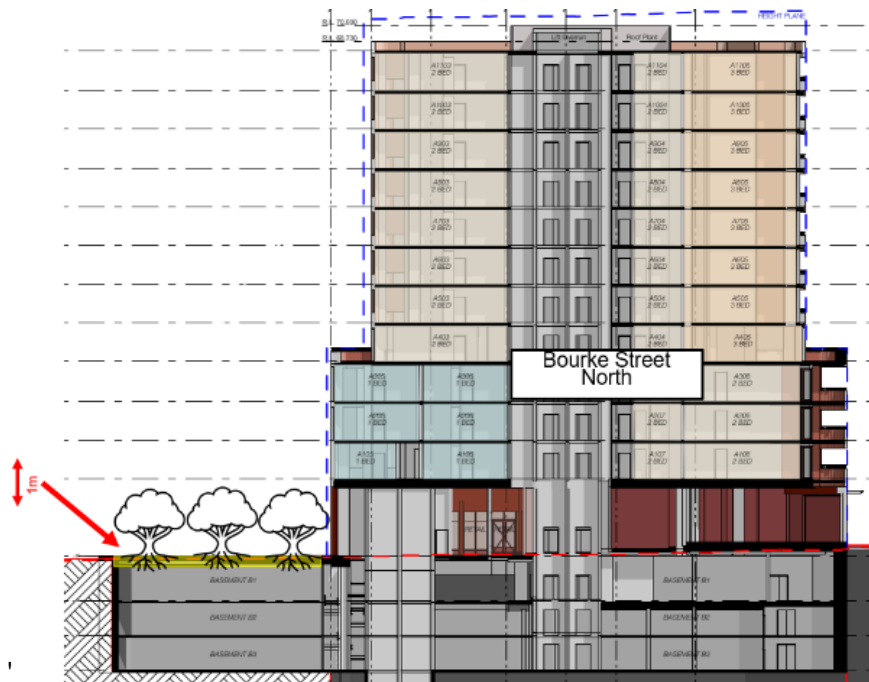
A condition is recommended to provide for 1m depth of soil, providing approximately 160m³ of soil volume to provide for medium sized trees to be planted at grade, with chairs and tables surrounding the trees on paving. The ceiling height of the basement is required to be decreased.
